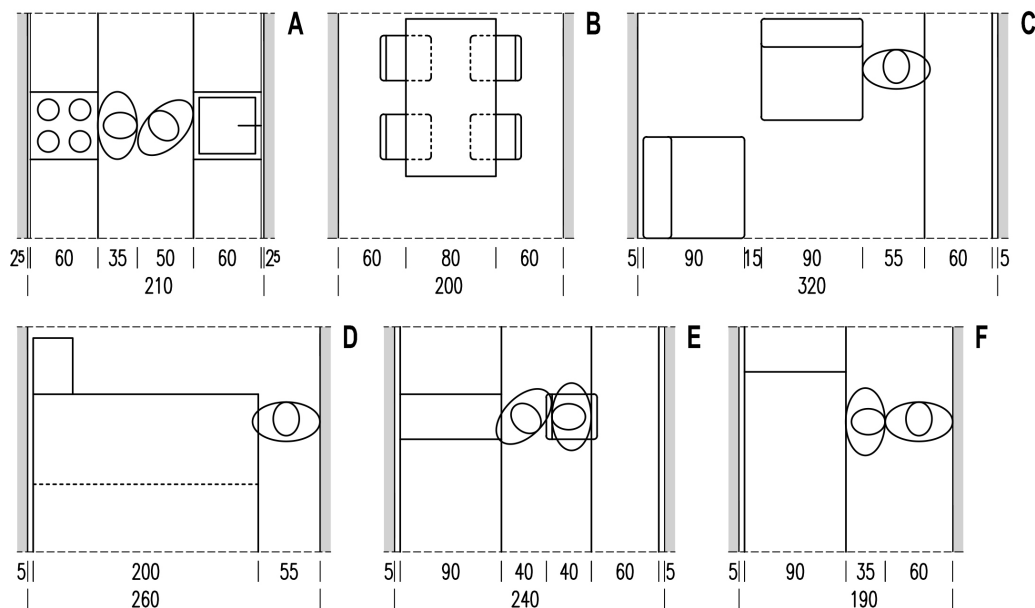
Minimum linear width of a room: a) two-row kitchen, b) dining room, c) living room, d) parents' room, e) room with 2 single beds and f) a room with a single bed (Source: Čanak, 2014)
